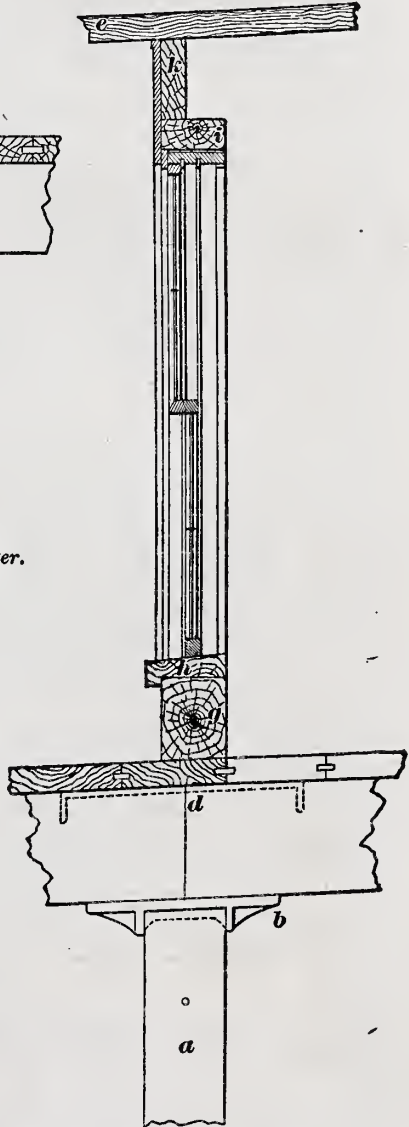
Section of Monitor.—Scale, 1/2 Inch to the Foot.
